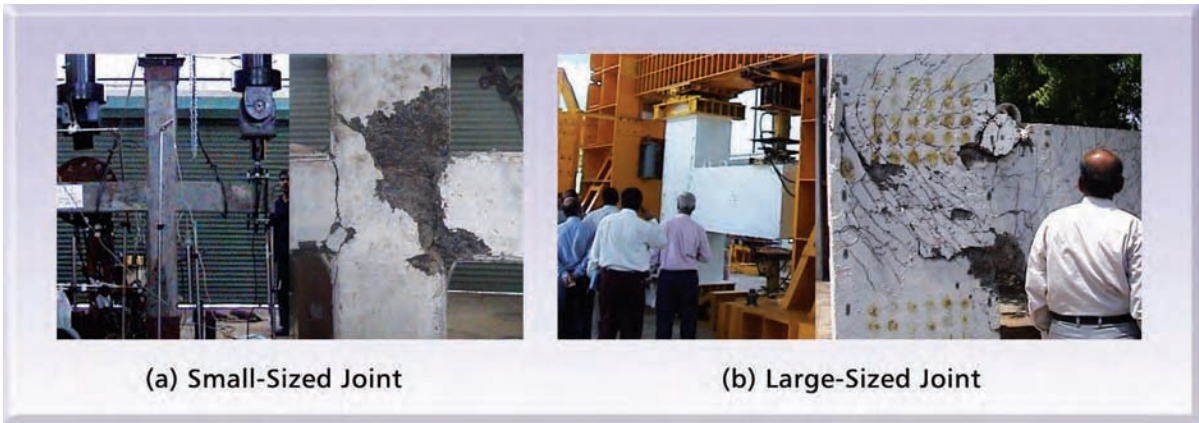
Testing under progress and damaged state for beam-column joints
